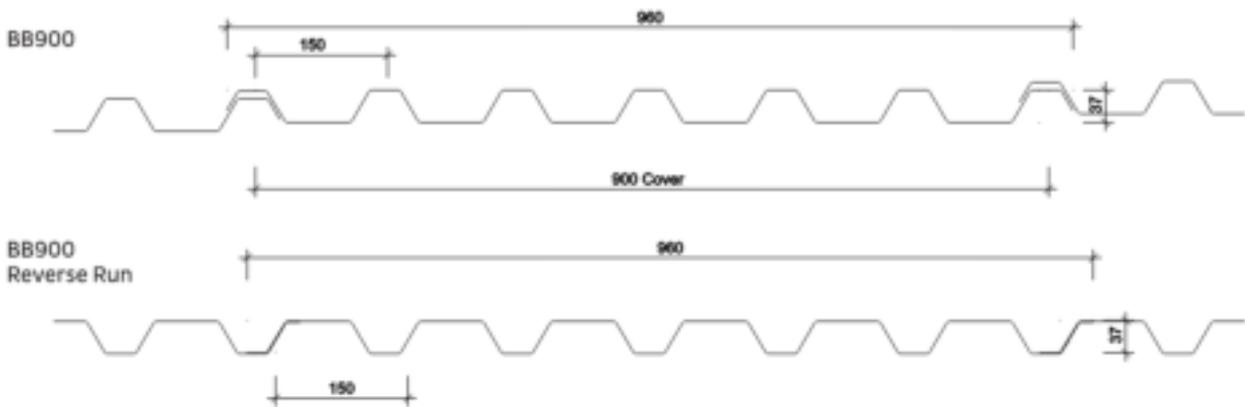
Proposed substitute: BrownBuilt 900 section geometry (lower profile shown in intended orientation).
